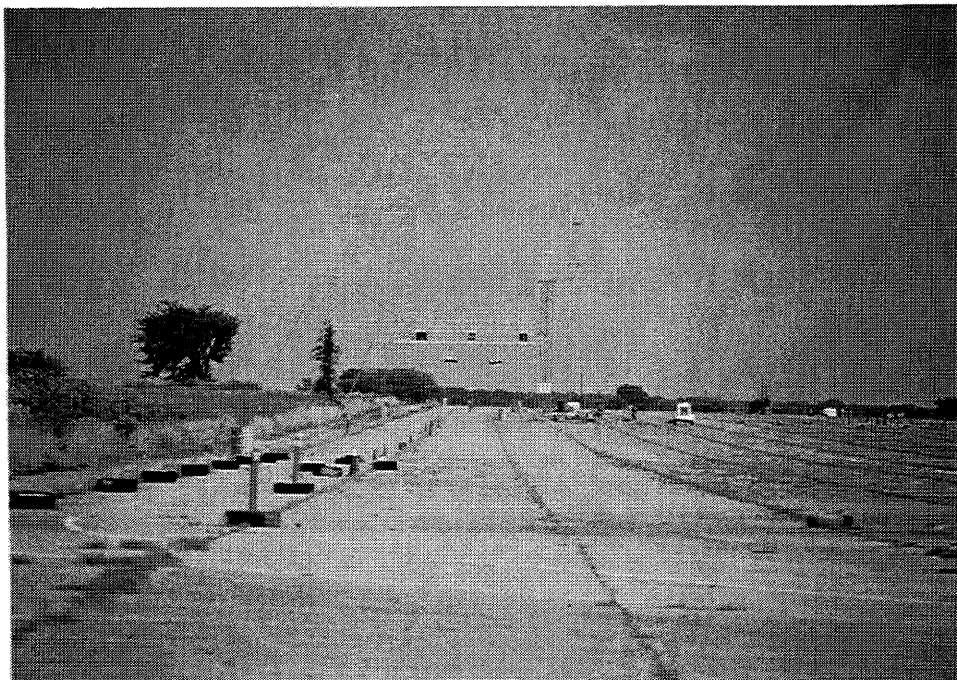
Sign Structure Installation of LCS at the TTI Proving Grounds
